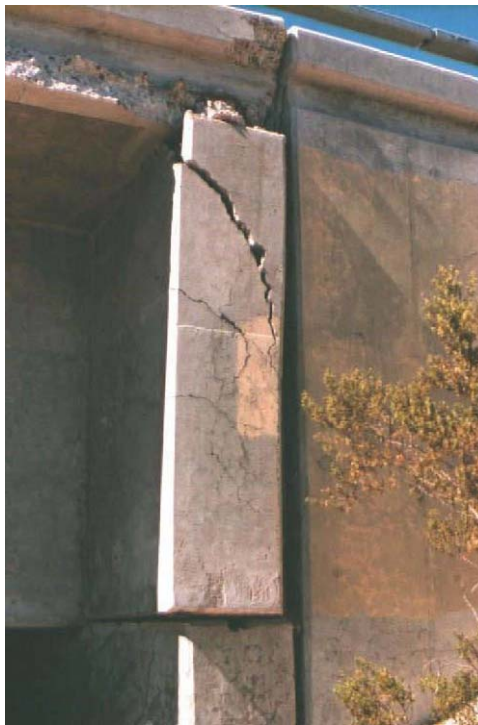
Damage and misalignment of east wingwall and pier at north bridge abutment.
